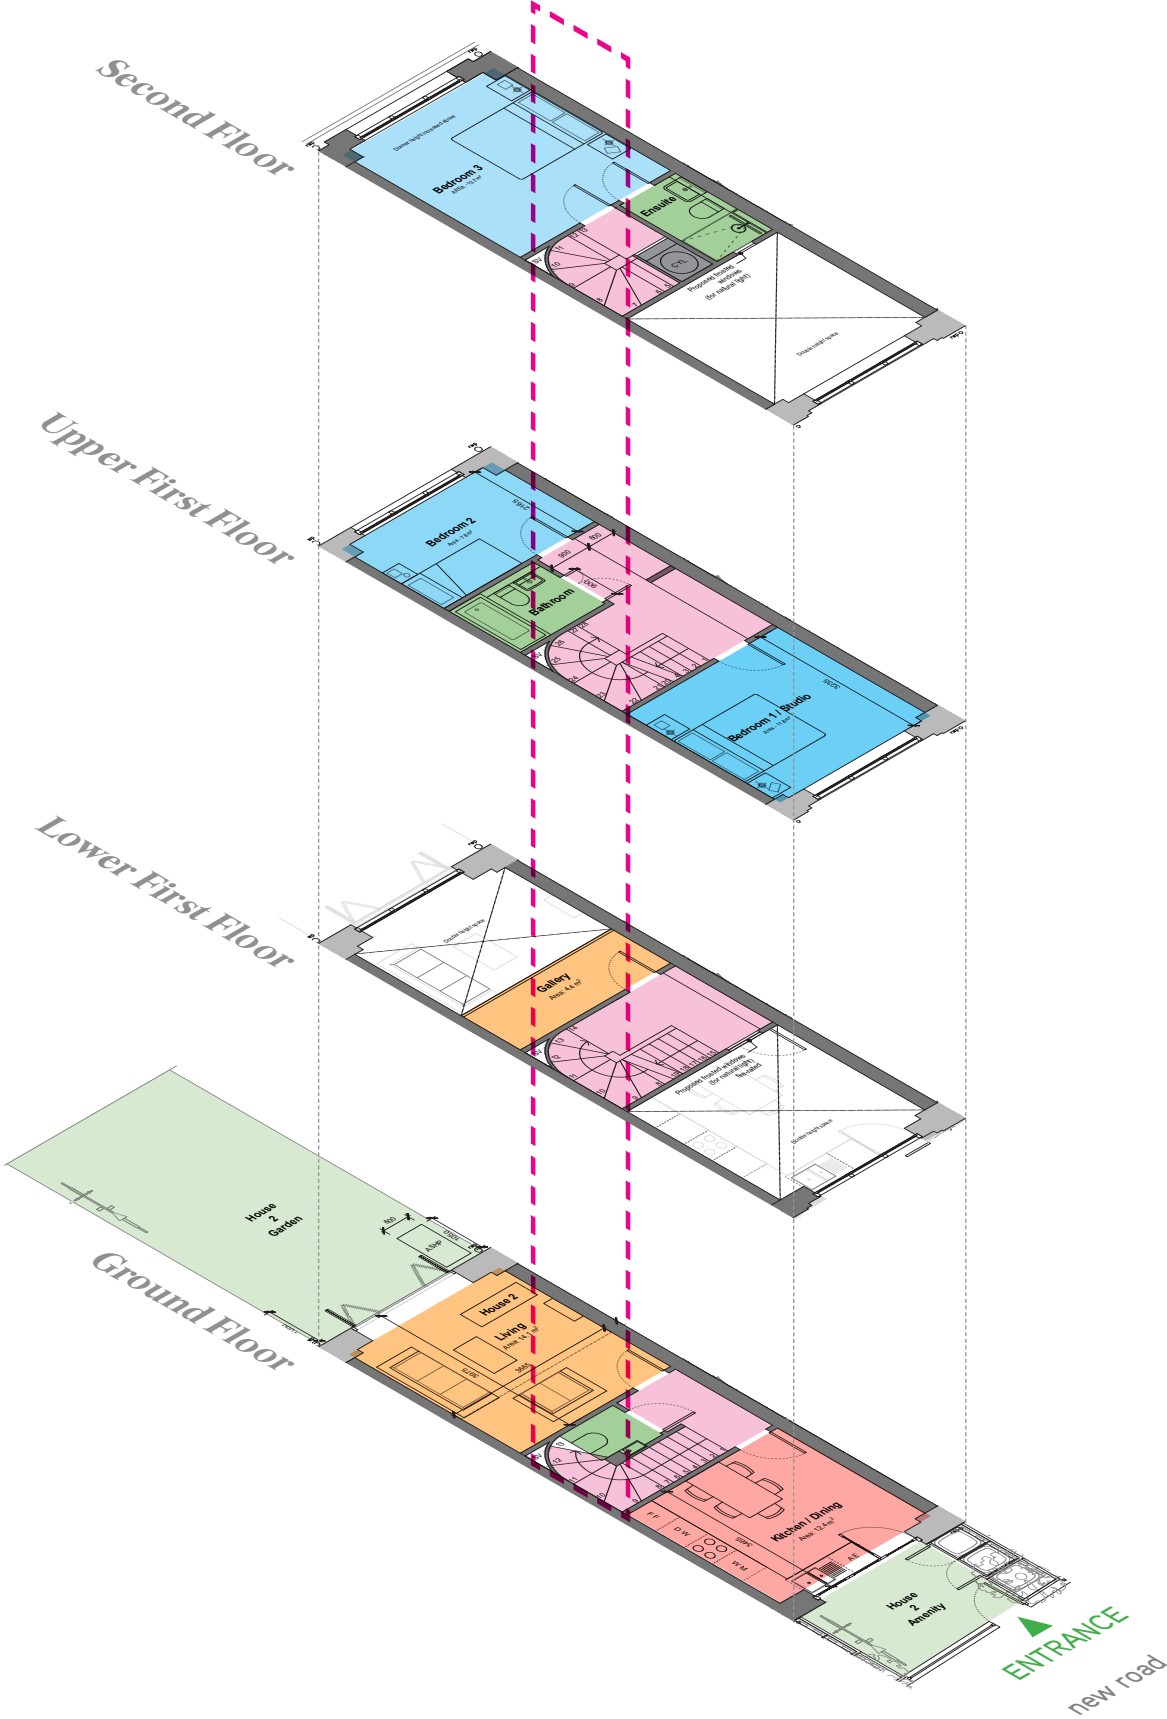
Houses 1 - 4 - Isometric diagram indicating general floor plan arrangement.
